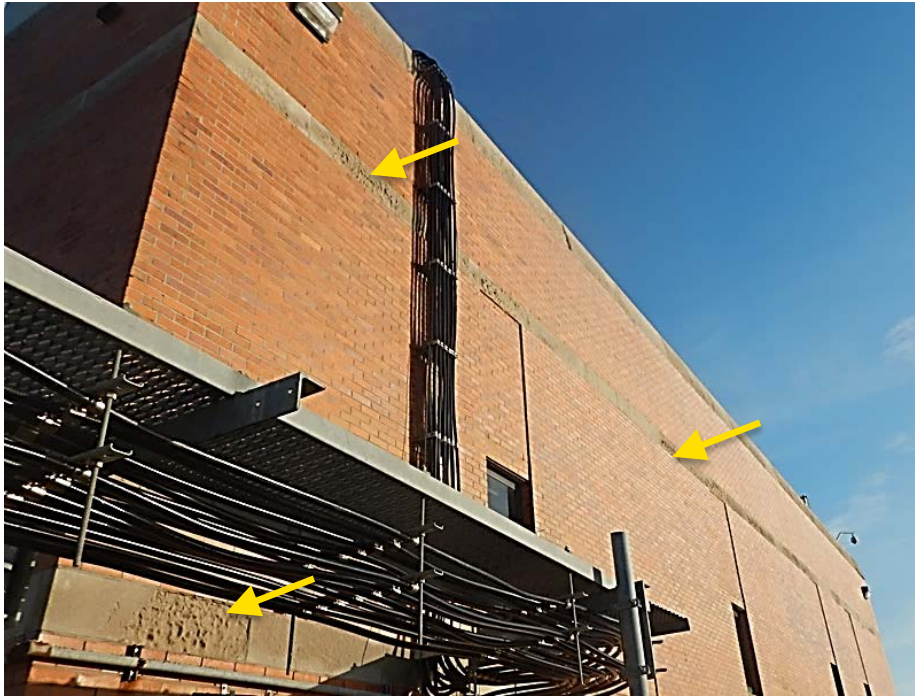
Portal Island 3 – Ventilation Building, Typical Erosion of Sandstone (Looking Northwest)
